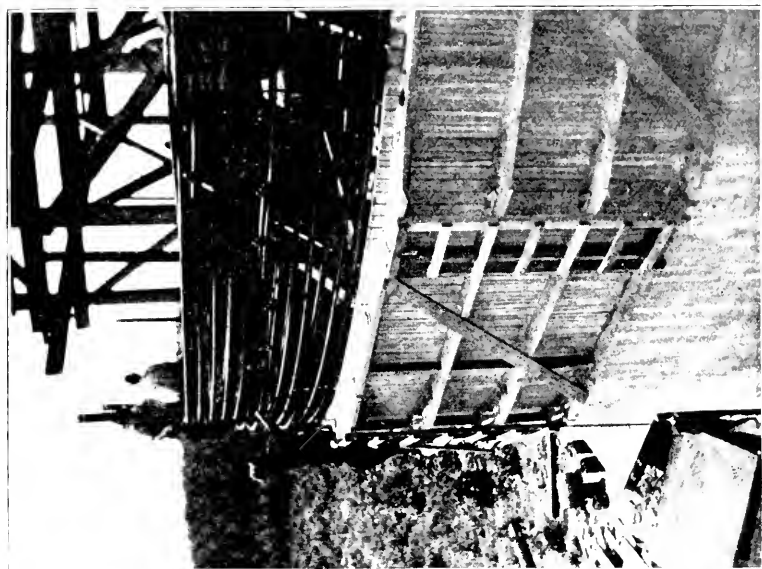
OUTSIDE FORMS AND STEEL REINFORCEMENT.
